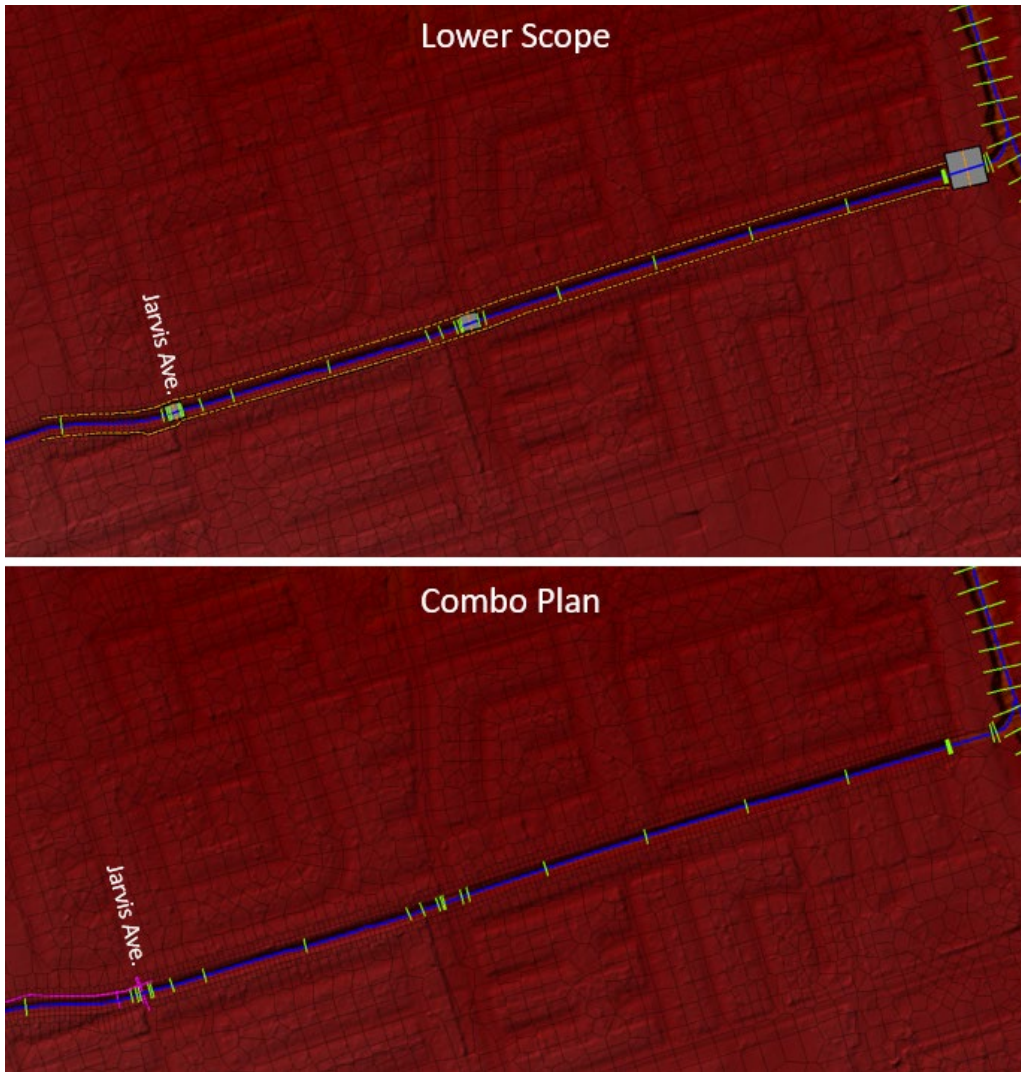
Lower Scope and Combo Plan Floodwall Positions on Ross Creek
